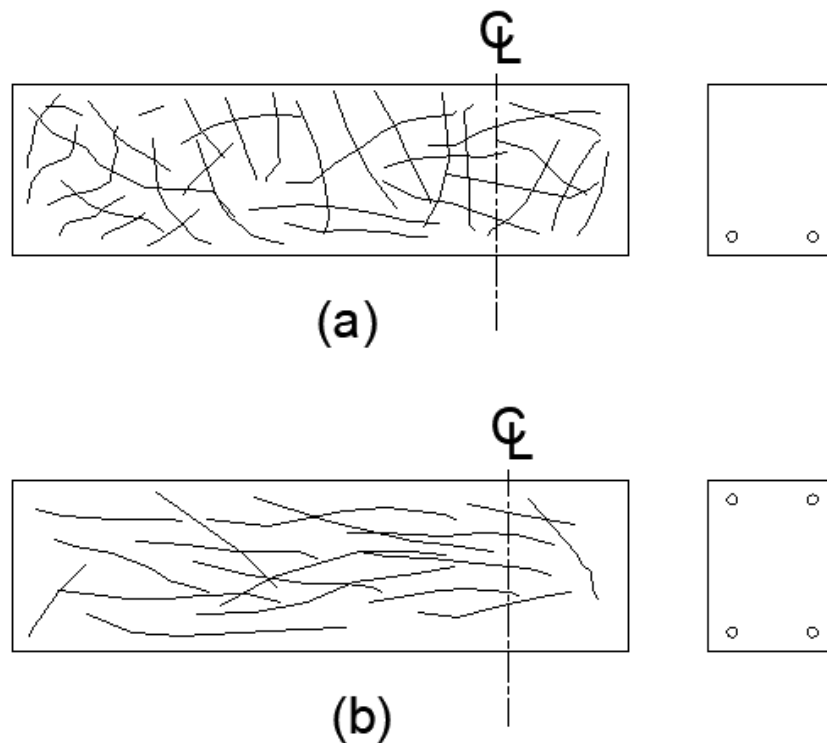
(a-b). Crack patterns of ASR affected beams having: (a) Bottom reinforcement; (b) bottom reinforcement equal to top reinforcement (adapted from ISE (1992)).
